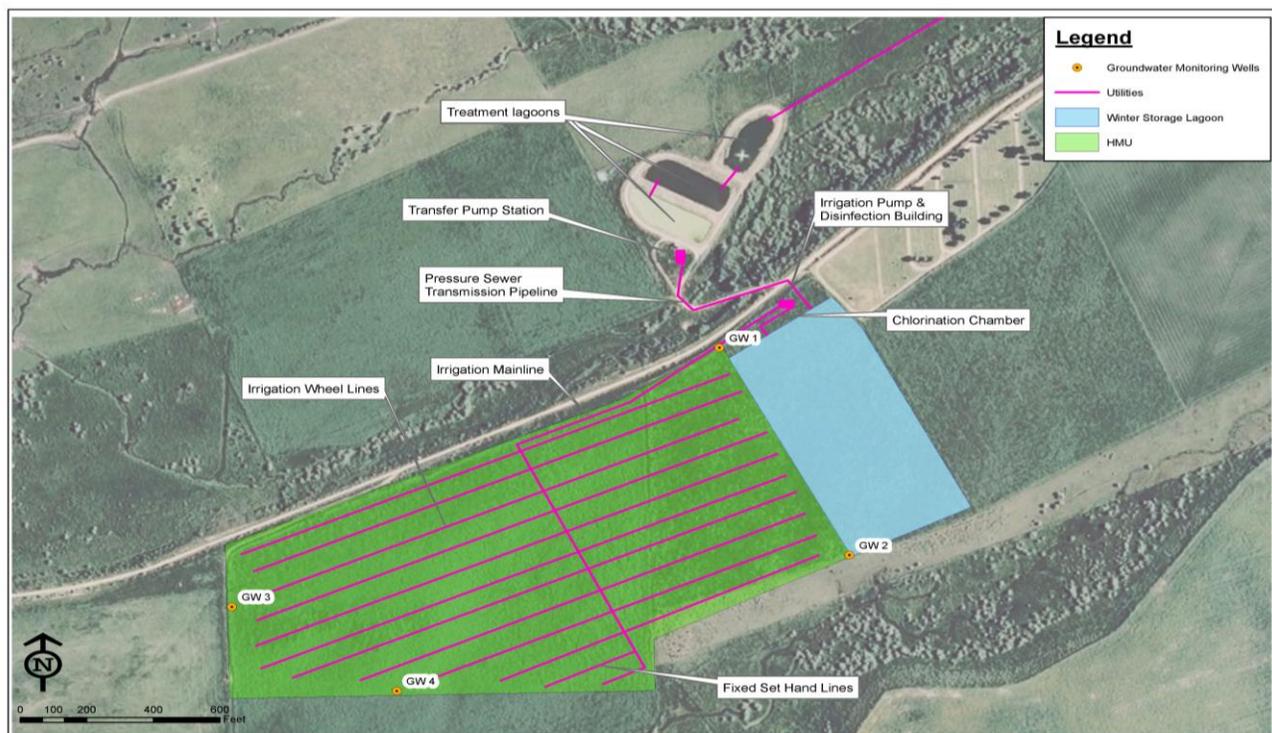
Site property boundary, sprinkler layout, and lagoons (Keller 2013, Figure 2-1)
